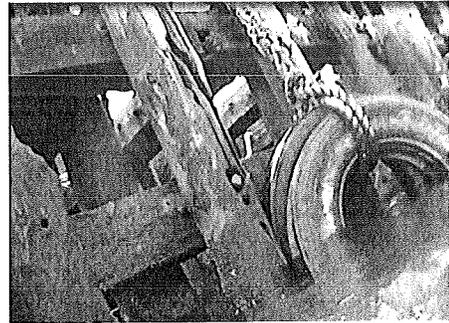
South fender system, northeast end, typical piles in poor condition due to splits and rot, looking southwest.
